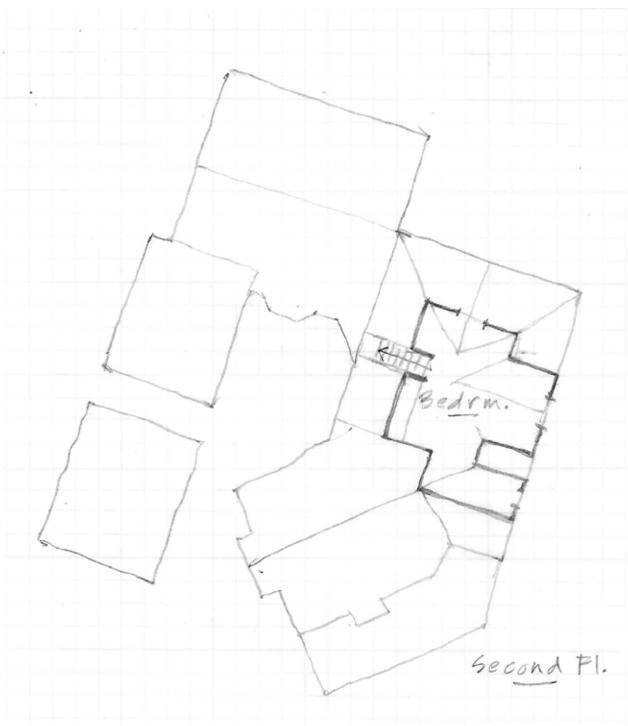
1850 Alameda Diablo – Second floor plan (south is up)
